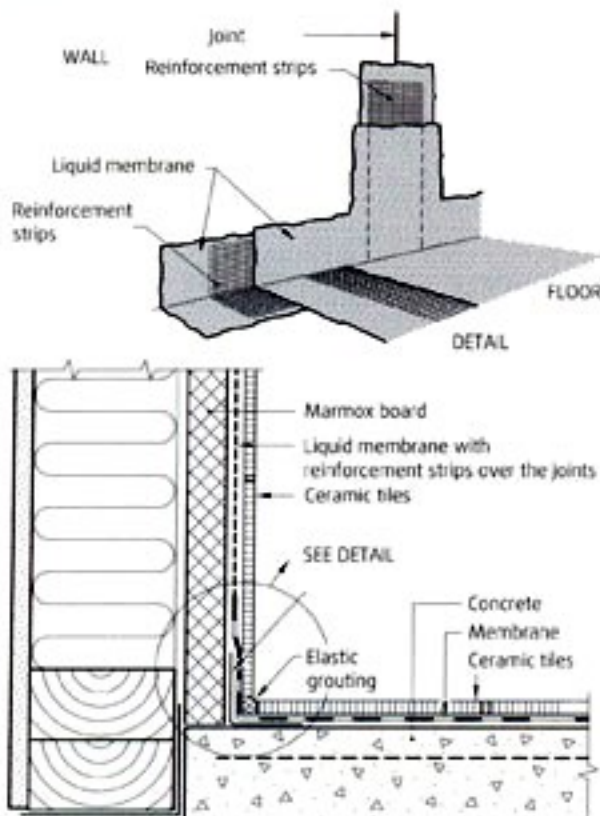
Example of connection between wall and a tiled floor with a membrane on the top of the floor.
